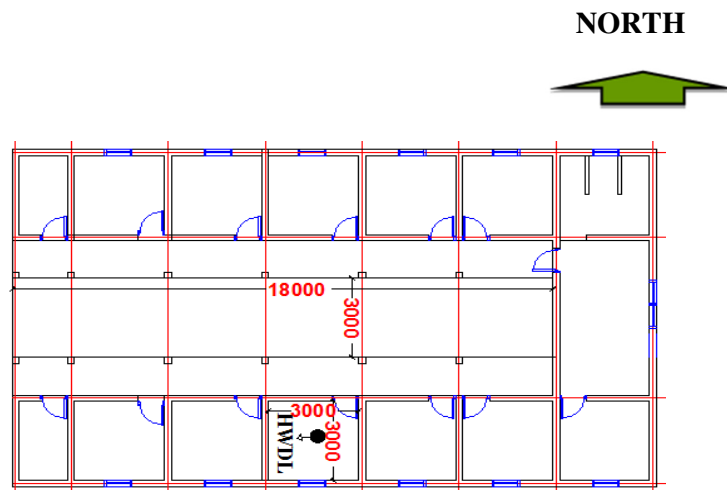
Floor Plan of the Semi-Enclosed Courtyard House (case-study 1)
